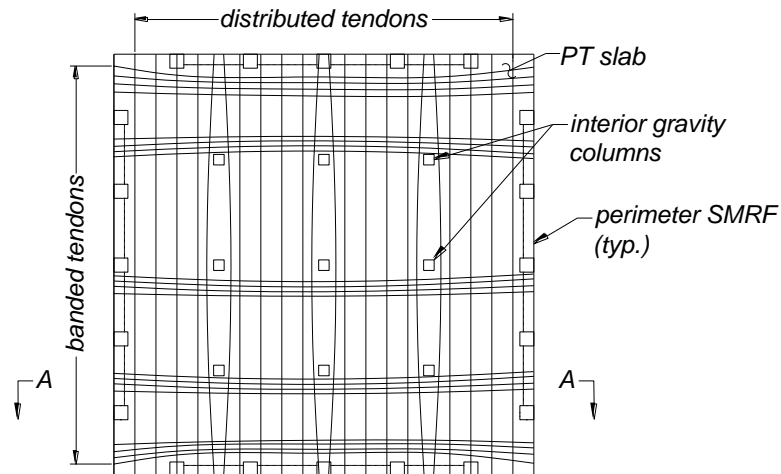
Floor plan of typical perimeter SMRF building with post-tensioned slab (Section A-A shown in Figure 4.1.6).
